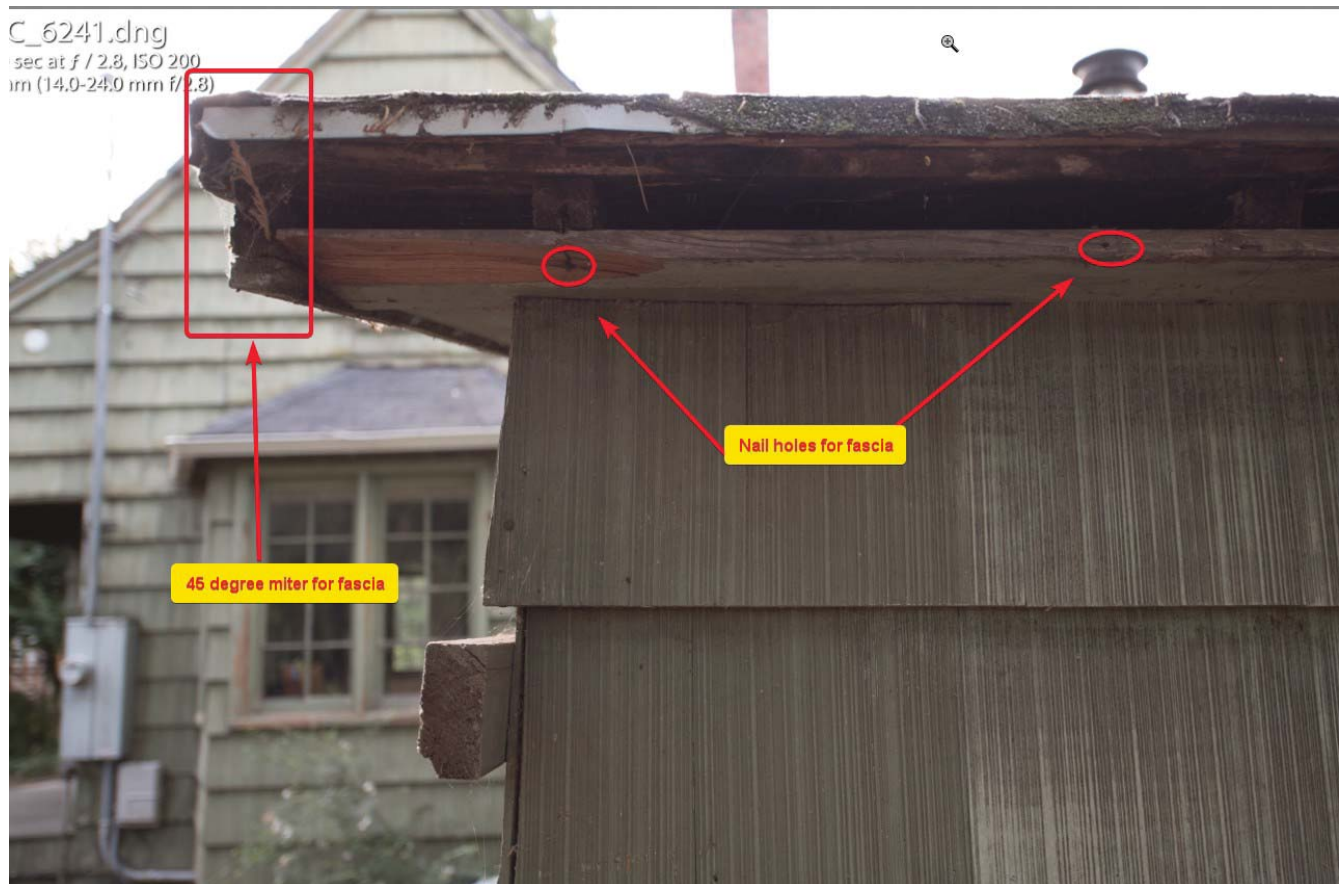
Northwest Corner of Garage Depicting Missing Fascia
